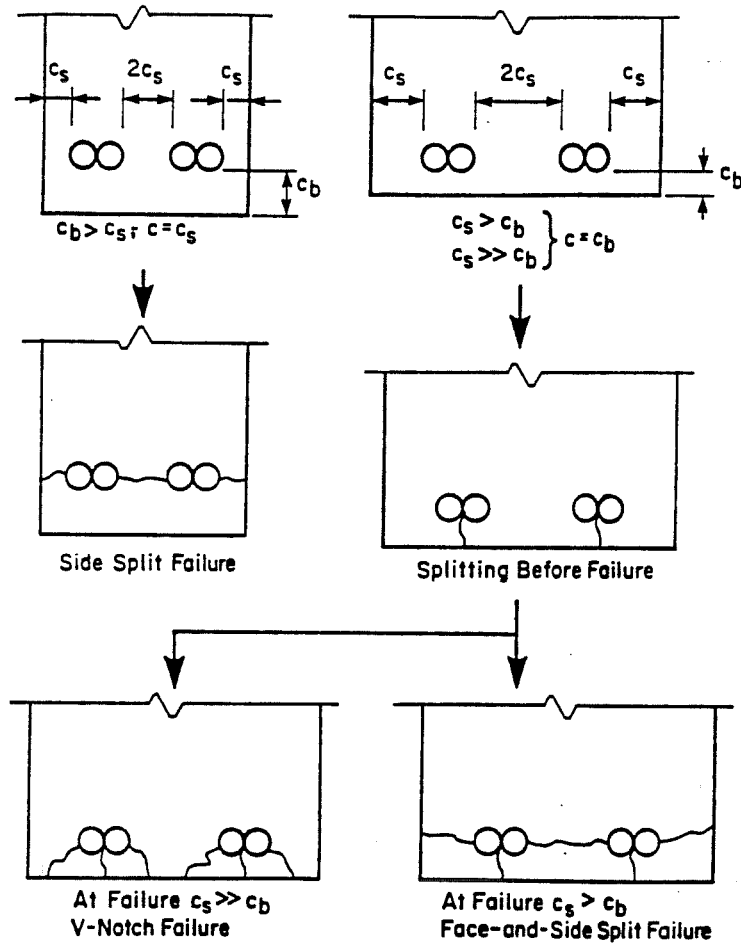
Splitting Bond Failures, Orangun et al. [14]
